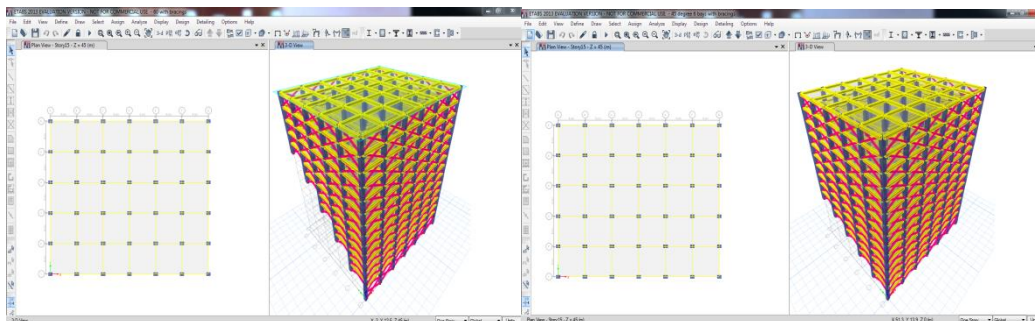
3D View of 20 Degree Sloped ground building Fig 5.4: 3D View of 45 Degree Sloped ground building
